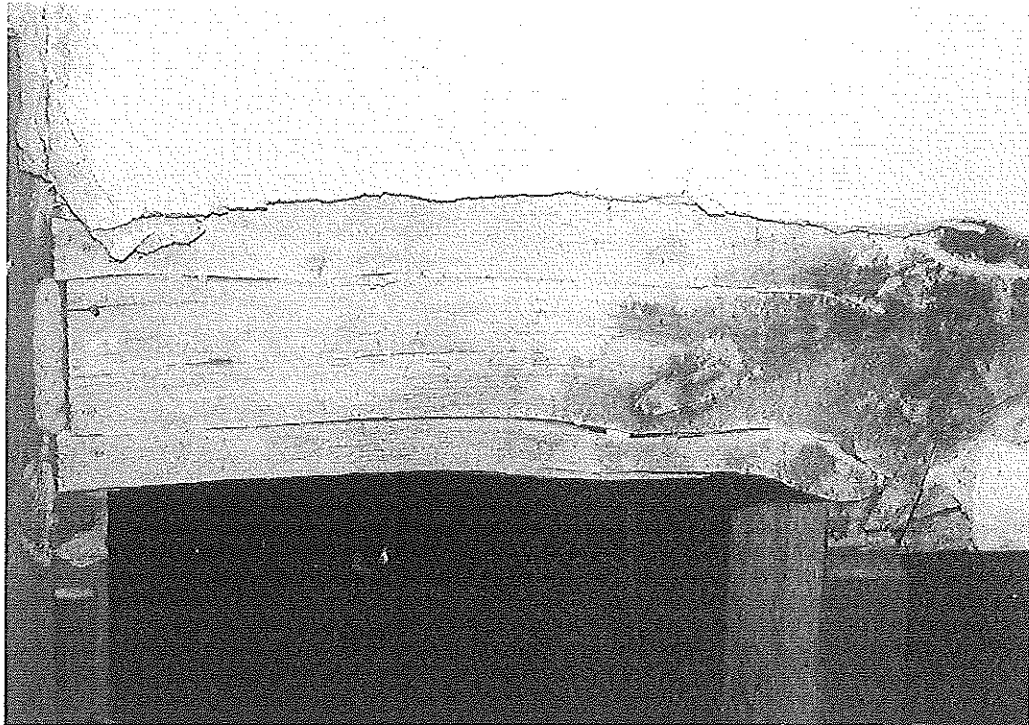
Dining Room, south wall: plaster on split lath on studs.
